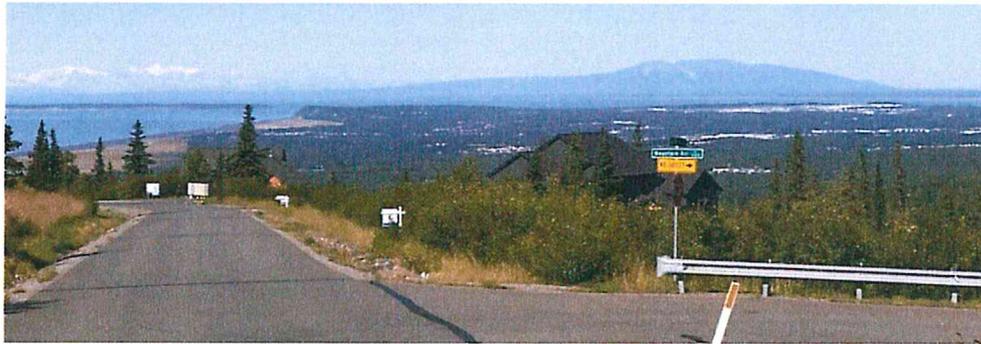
The intersection of Sandpiper Drive (left) and Mountain Air Drive (right)
